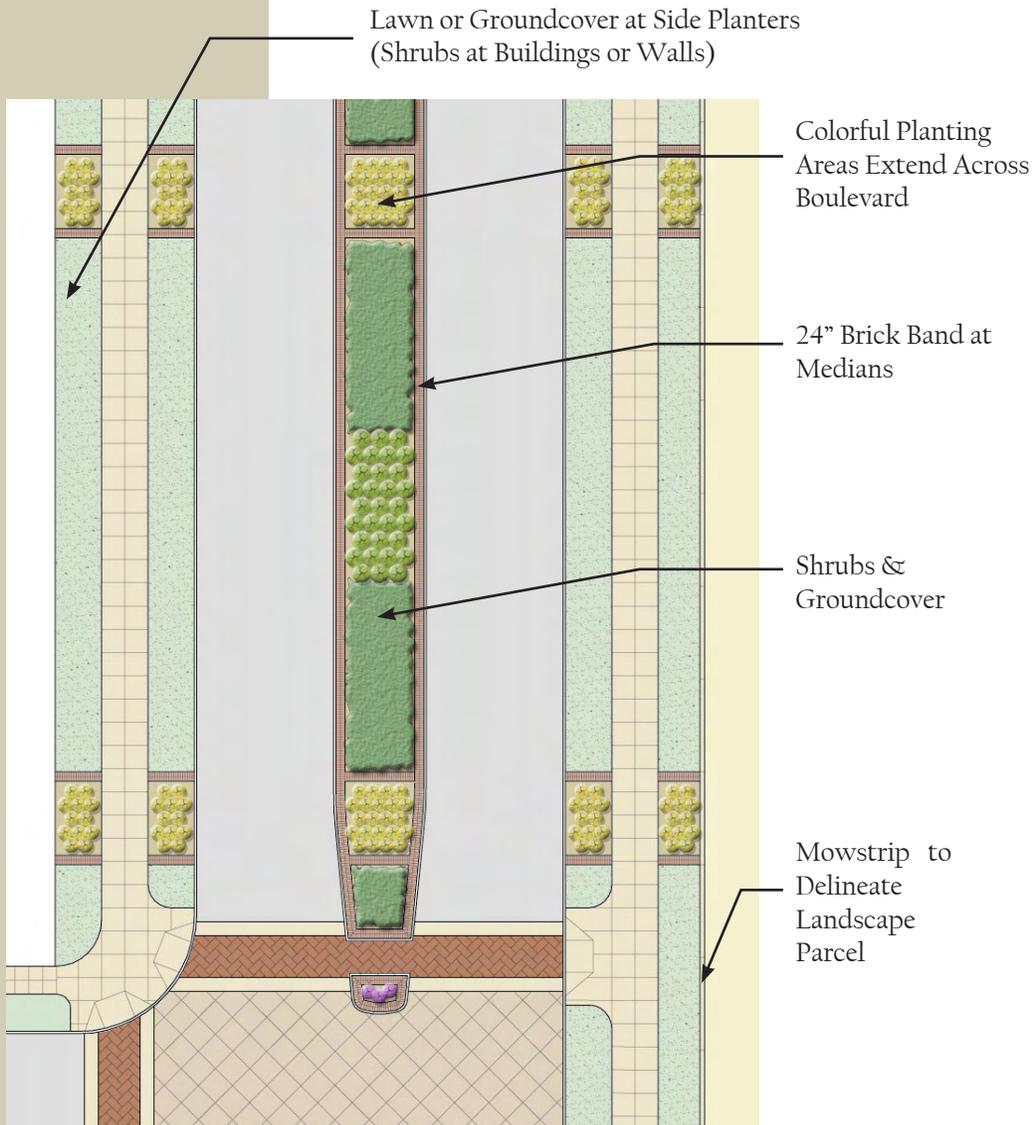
Conceptual Streetscape Shrub Planting Concept
